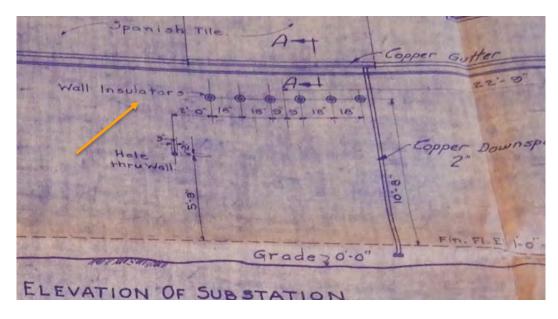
Excerpt from 1926 as-builts for the former substation at 498 Del Monte Avenue showing the wall insulators on the building's southern elevation (denoted by yellow arrow).
